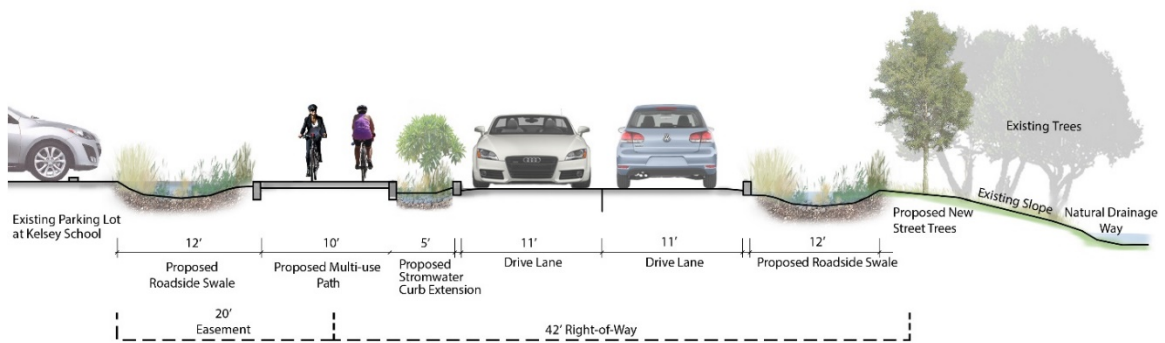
Section C-C – Proposed Street Cross Section (By author)
